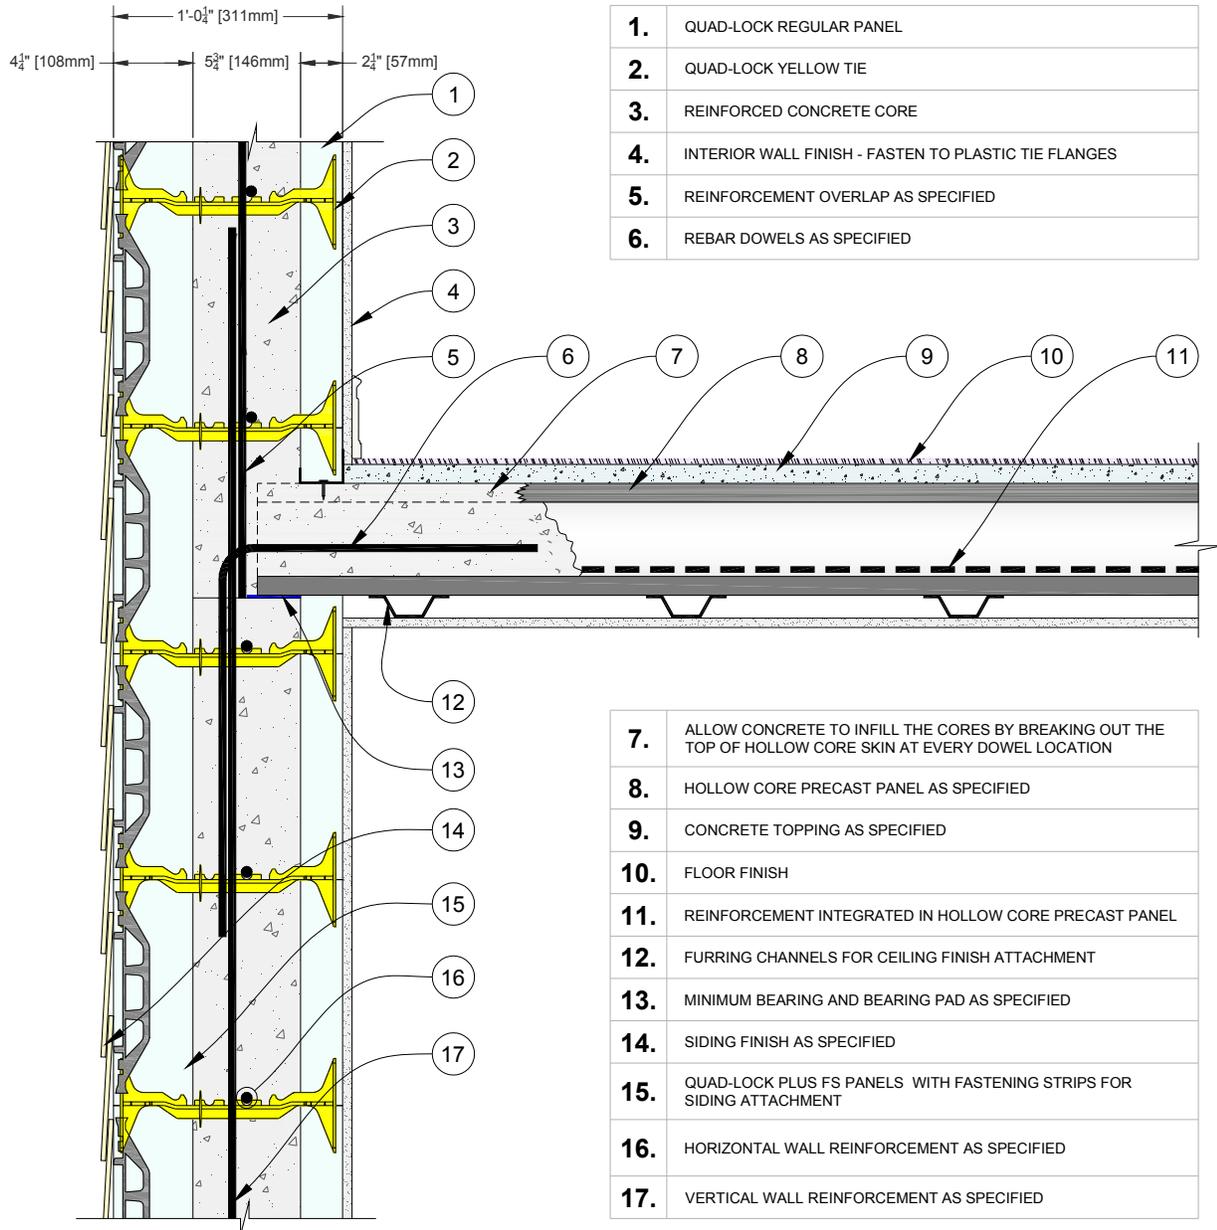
Typical Hollow Core Precast Floor Slab Connection
